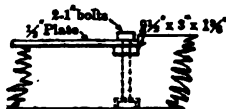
A. Alternate Detail of Joint 1, Fig. 8
